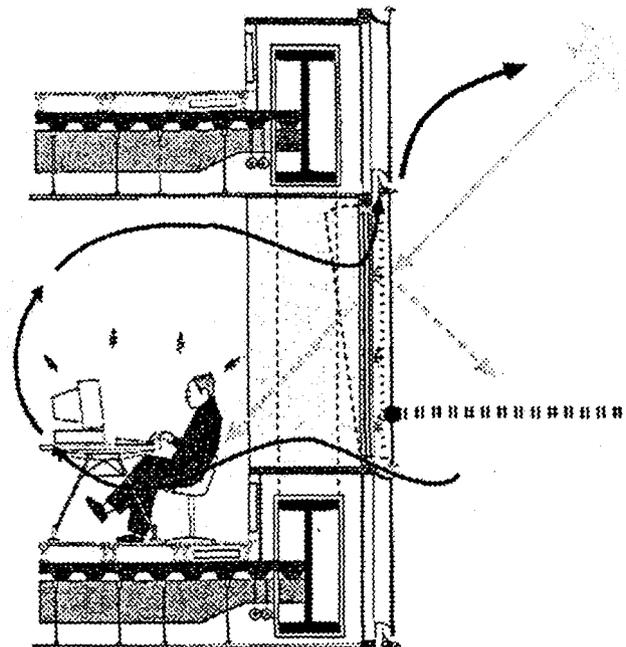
Detail of ventilating glass wall, R. Rogers, Commerzbank, Frankfurt, 1997.
